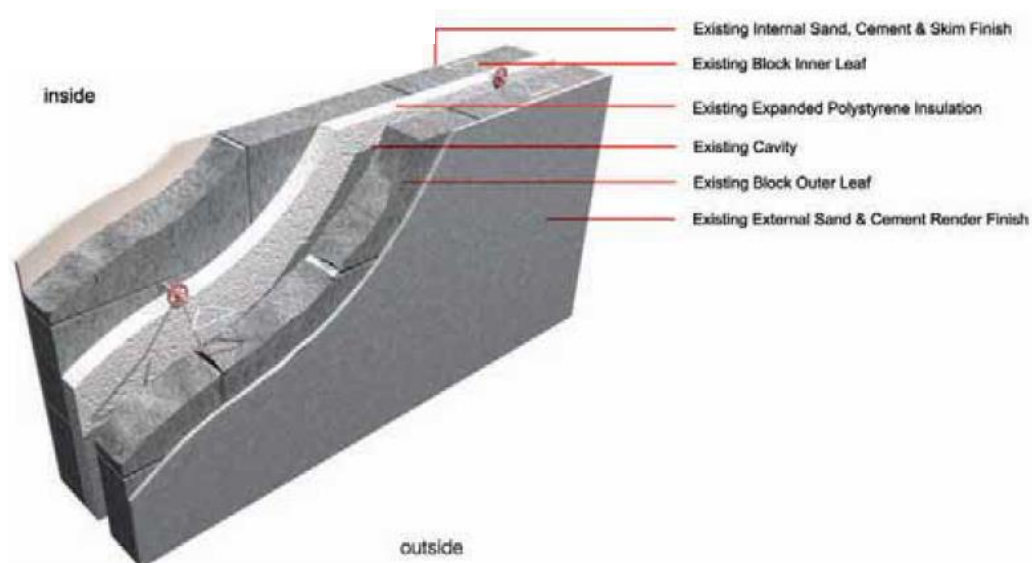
Typical Cavity Wall Detail (Source: SEAI, Passive House Retrofit Guidelines)
